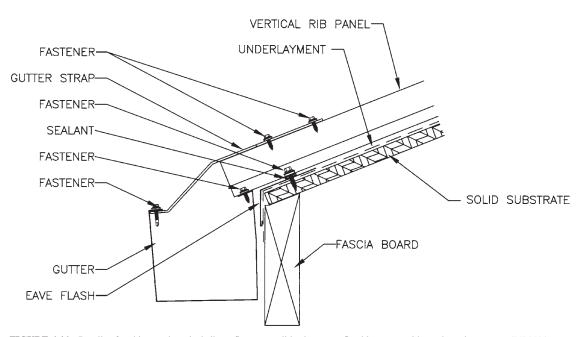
Details of architectural vertical-rib roofing over solid substrate at fixed low eave with posthung box gutter. (MBMA.)
